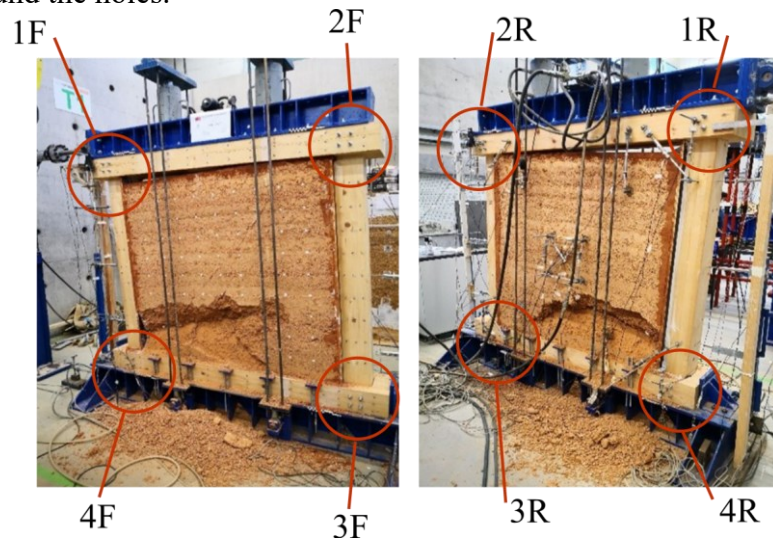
TREP3 test – Highlight of the damage in the rammed earth panel: a) front view; b) rear view.
